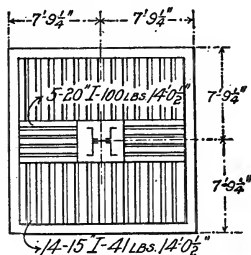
shows a simple beam footing used in the Marquette Building for a column load of 920,250 lbs.
